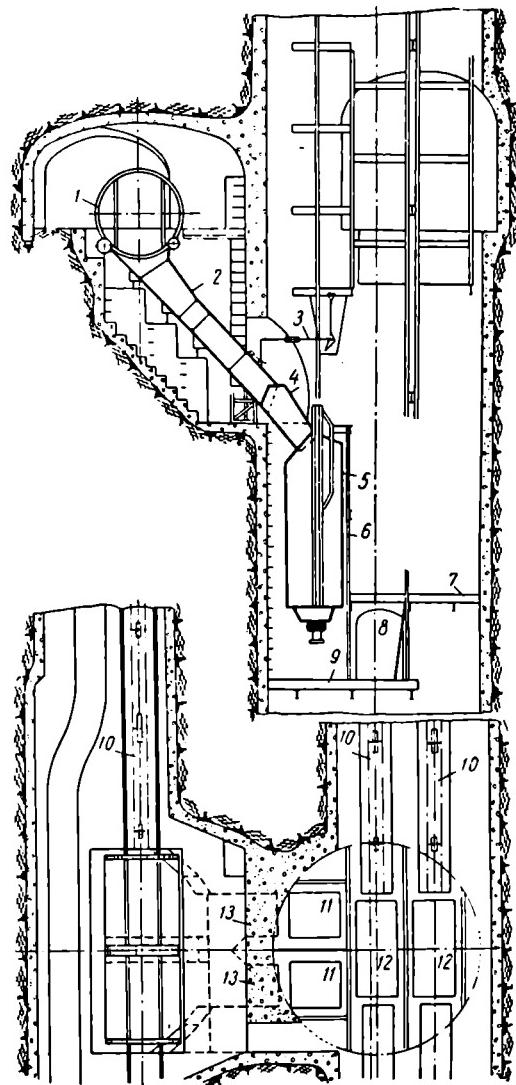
Loading arrangement in skip hoisting with a low-capacity coal pocket
